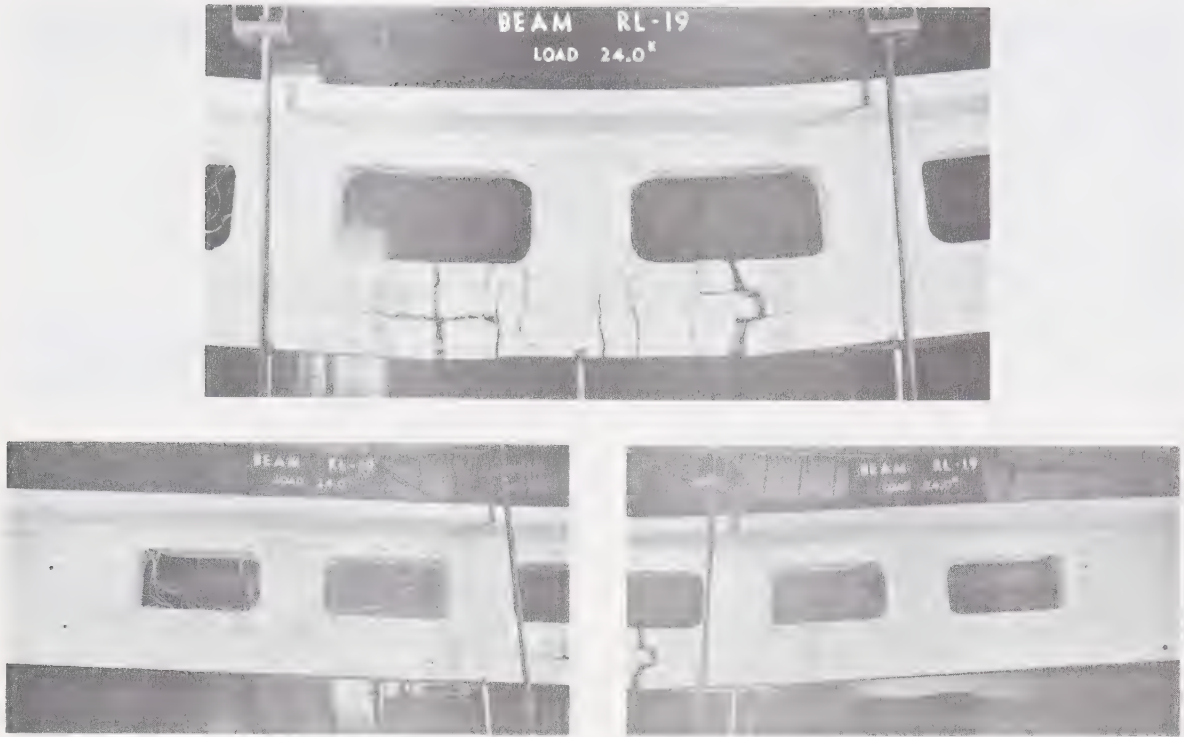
CRACKING AND FAILURE PATTERN OF BEAM 19-16-6
